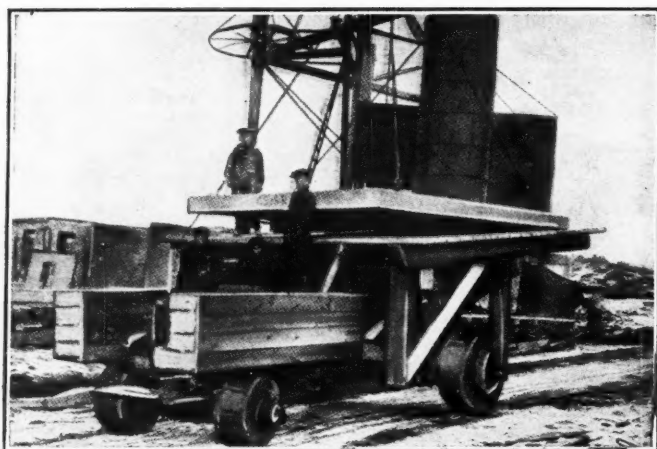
CRANE LIFTING CONCRETE UNIT FROM "BUS"
